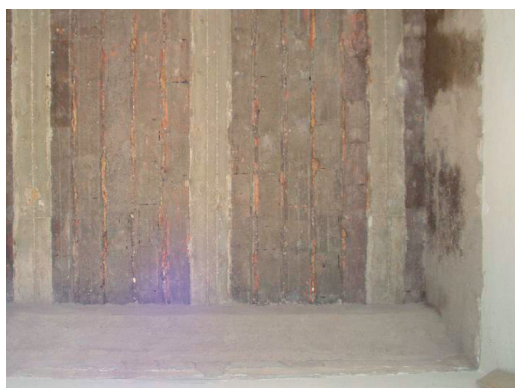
Intrados of the reinforced clay beams floor after the intervention.
